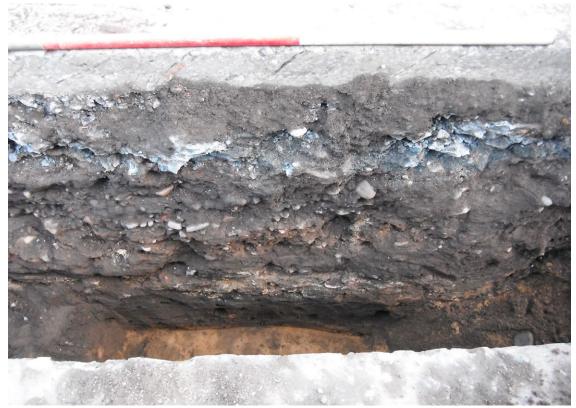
Section showing the road construction layers, modern deposits and deposit 006
